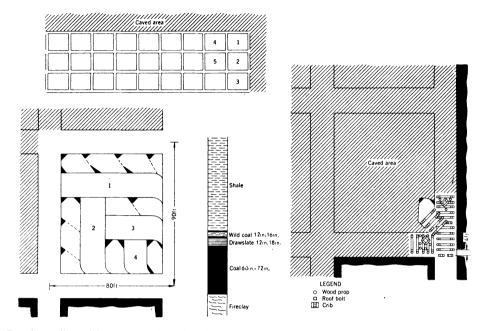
Split-and-fender pillaring with ripper-type continuous miner in Pittsburgh coal bed using bolts for roof support.⁽⁴⁾
